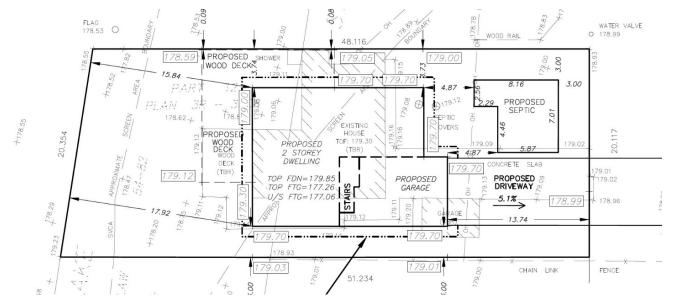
Proposed Site and Grading Plan showing proposed fill pad in dashed/dotted line.
